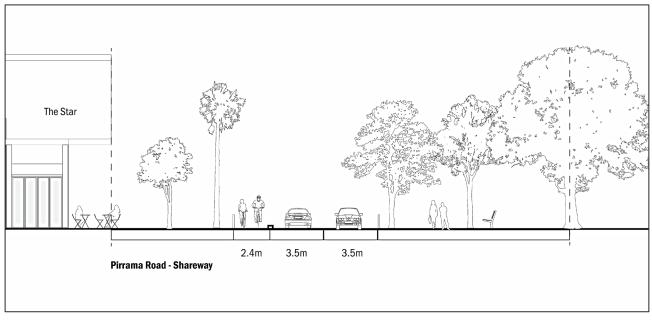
Site elevation / section 2: Pirrama Road shareway  $({\sf Hassell})$
